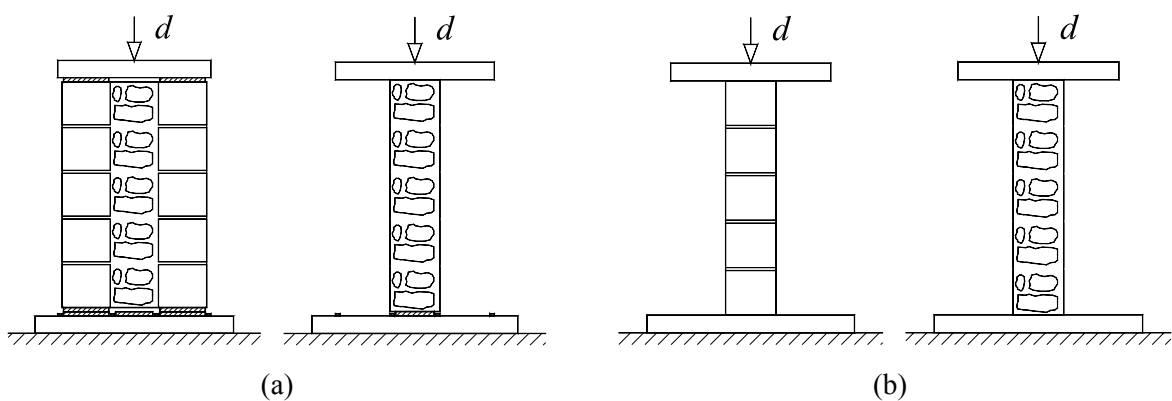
Test setup for the compression tests on single leaves: (a) *Noto* wallets and (b) *Serena* wallets.
